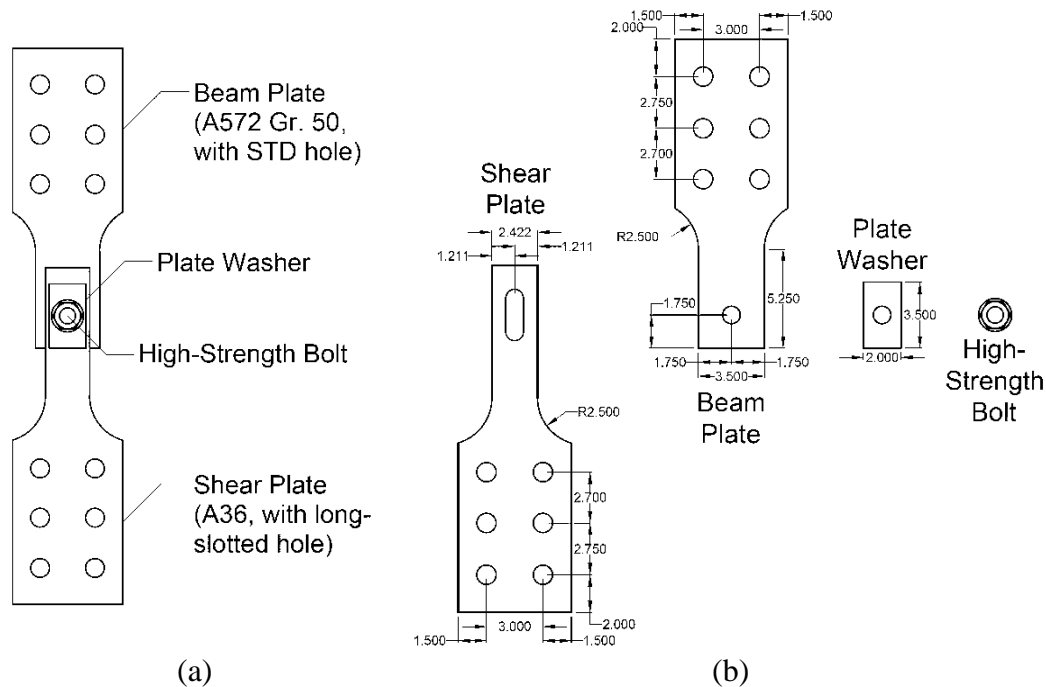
(a) typical steel component specimen, and (b) exploded view with annotated dimensions. All dimensions in inches, 1 in = 25.4 mm.
